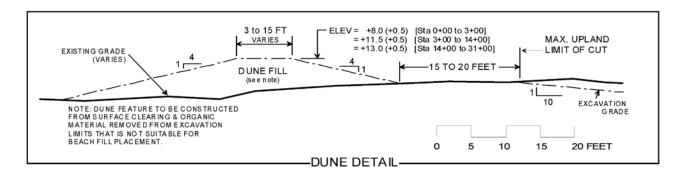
Sections and Detail of Excavation within the Project Borrow Area
